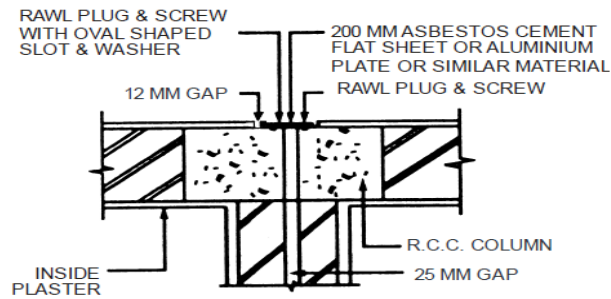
Typical Details of Expansion Joint Covering on Outer Face of Columns (Plan)
